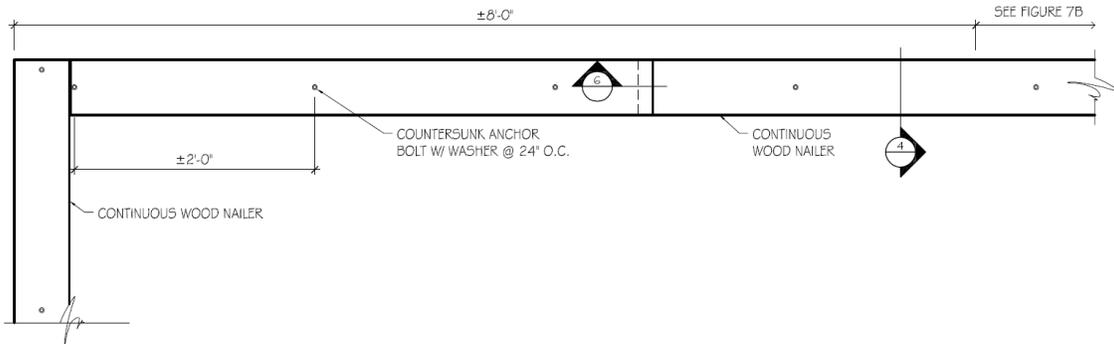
A - ROOF EDGE WOOD BLOCKING @ CORNER - THROUGH BOLT ANCHORAGE 8'-0" FROM CORNER
